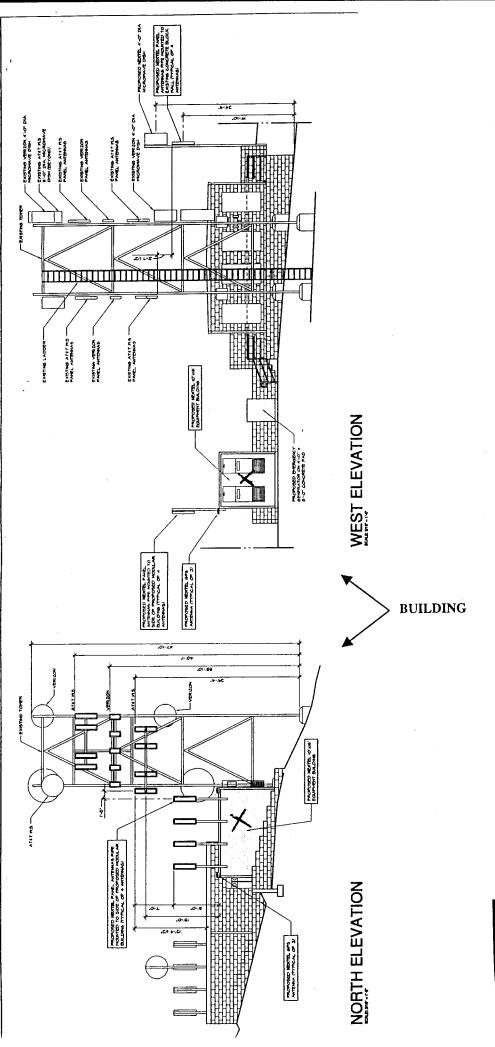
APPLICATION NO. 6-04-139 Elevation •
